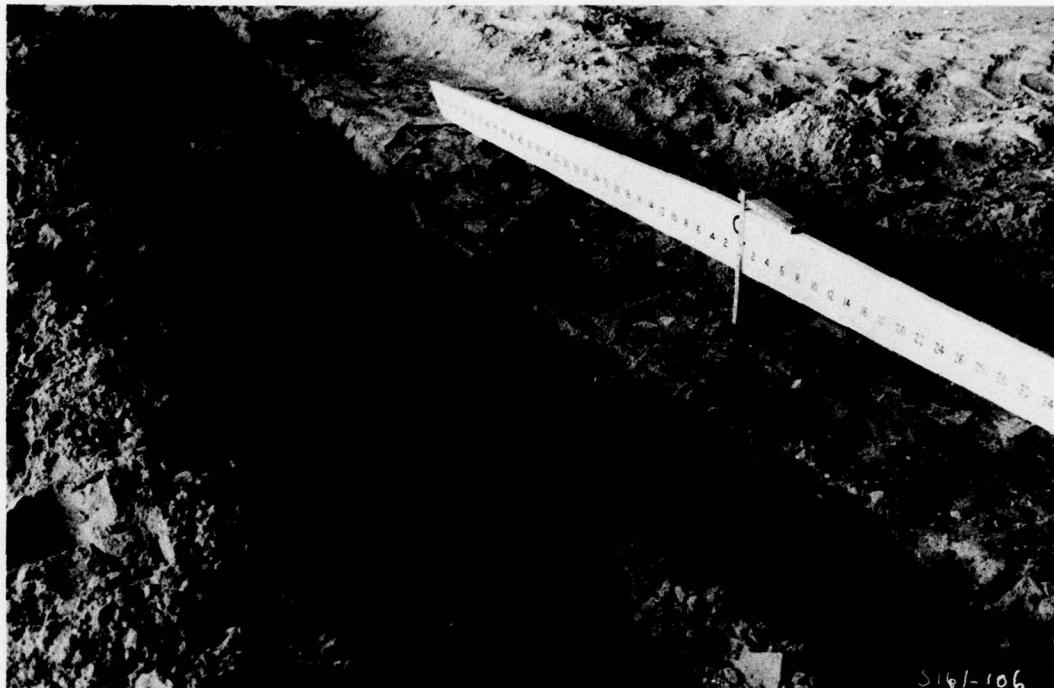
Test Section No. 3, item 1, trench after 200 coverages
